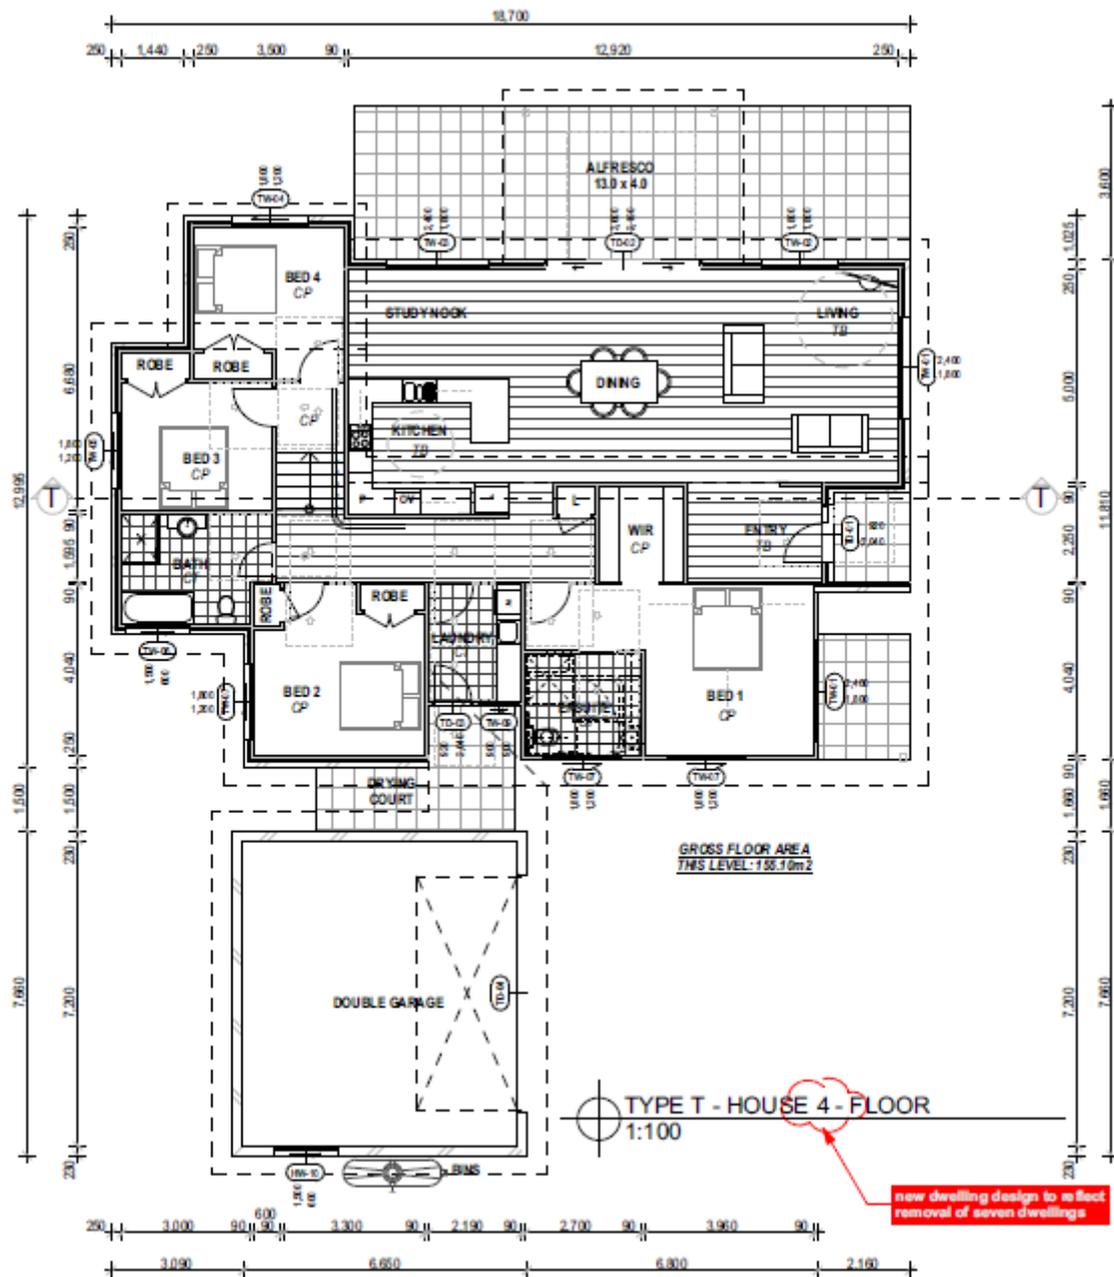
Proposed Housing Type T Floor Plan (Dwelling 4)
